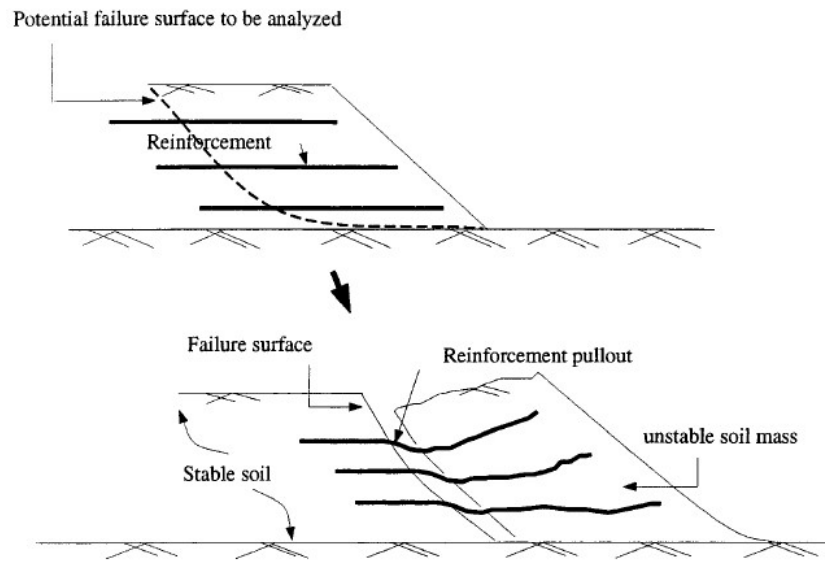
Typical sketch of Pullout failure (Mallick et al.,1996)
